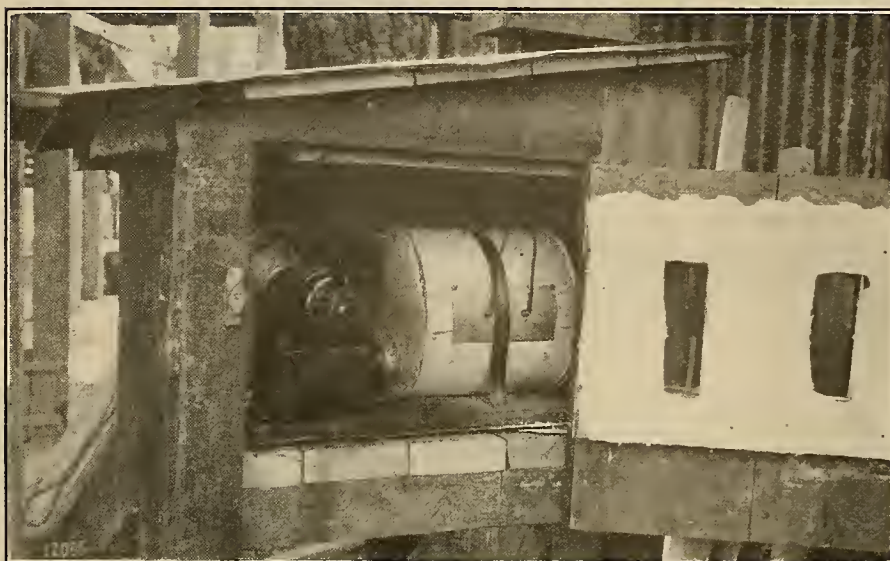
Typical installation of automatically controlled heater for powder houses. Air is forced through the jacketed heater unit, through protecting screens and into the house through several feet of pipe
